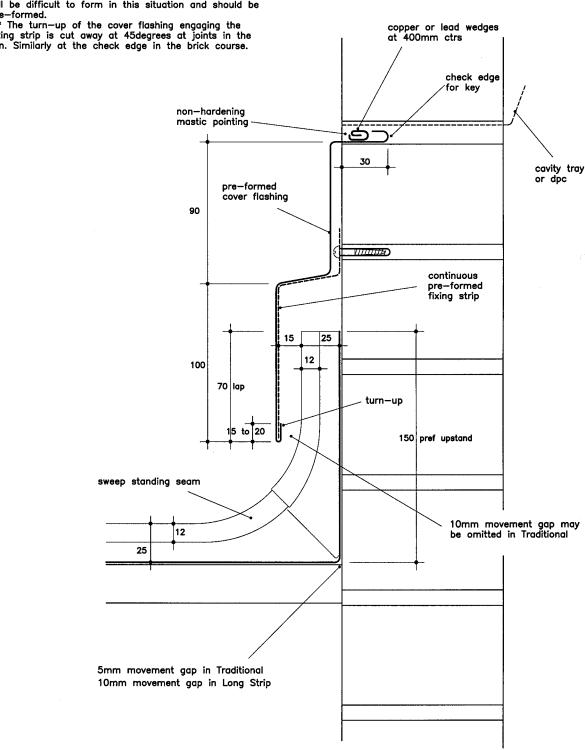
Vertical upstand with horizontal cover flashing to brickwork TRADITIONAL / LONG STRIP /
